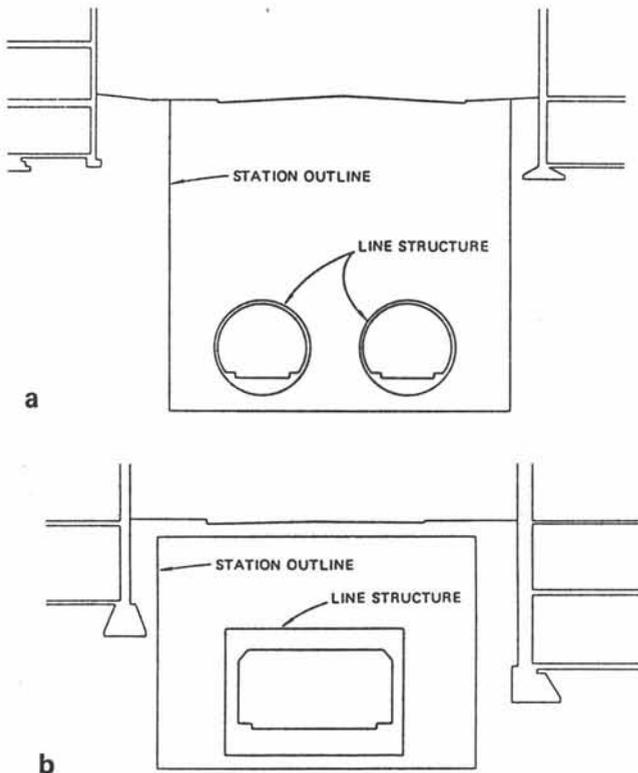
Typical sections of tunneled (a) and cut-and-cover (b) sections. Tunneled section is on Third Avenue; cut-and-cover section on Pine Street.
